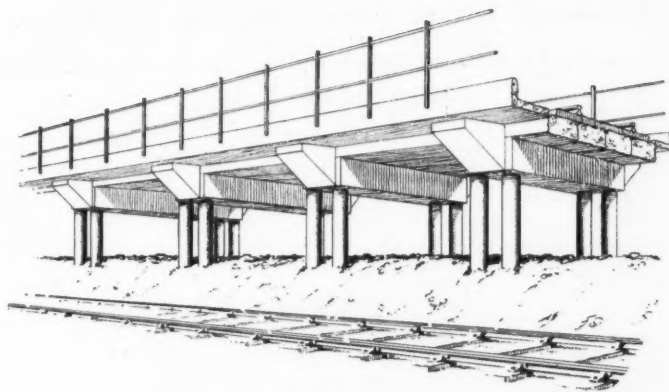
A coal stage built on concrete piles with cast in-situ caps and pre-cast beams. Footways are provided by light-section concrete slabs
